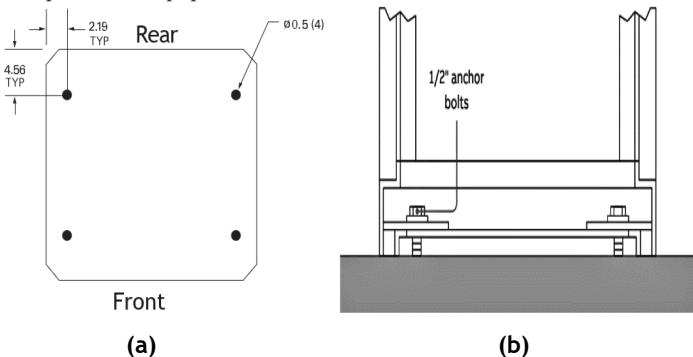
(a) Bolt-Down Hole Provision Locations on the Bottom of the Cubicles. (b) Switchboard Section Installed on a Foundation.
